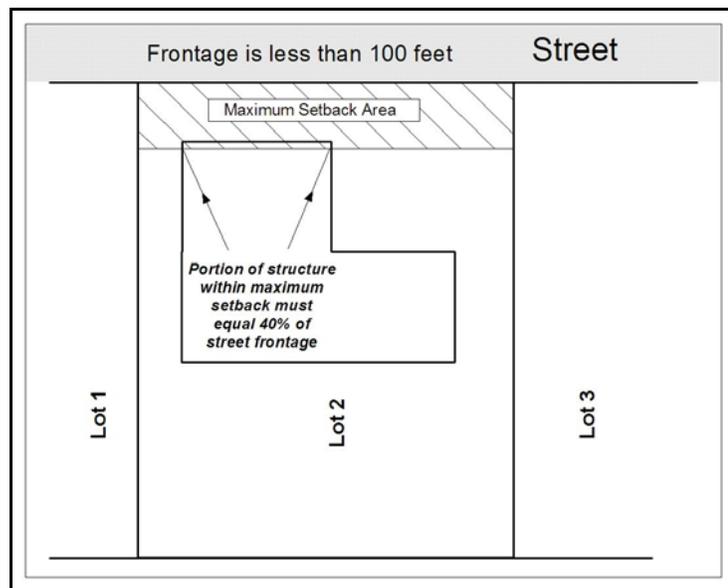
Portion of Building Required in Setback Area on Sites with Less Than 100 ft. of Street Frontage
